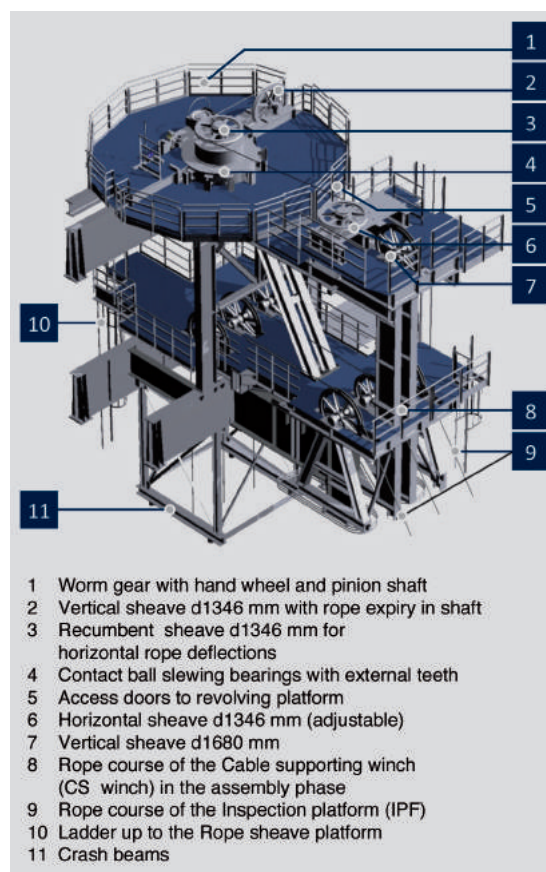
Set-up of the two reeling winches for assembling cables at the shaft bottom
